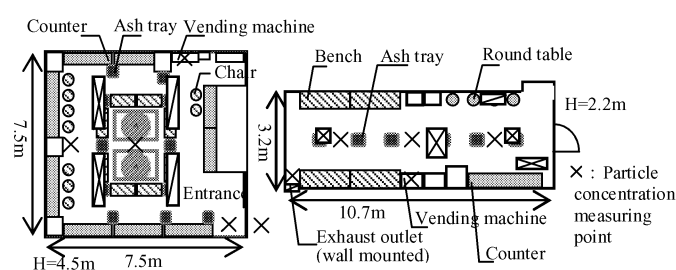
Floor plans of the target smoking rooms (Left: building A, Right: building B)
